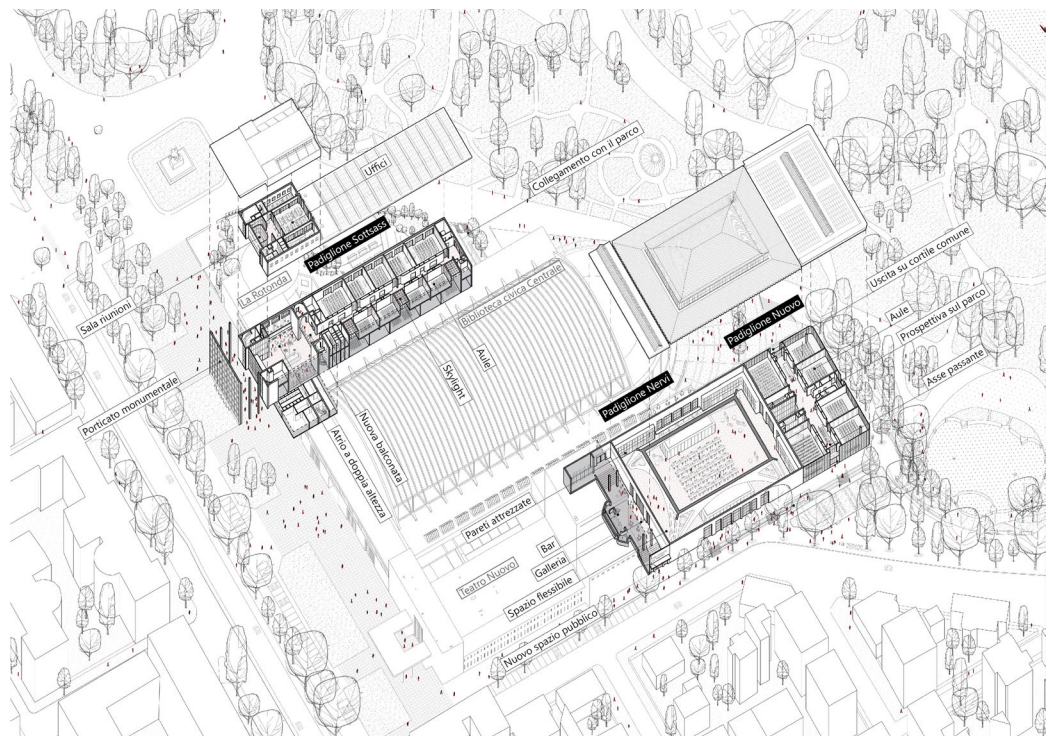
Detail axonometry of Pavilions I (Ettore Sottsass sr), 3A (Pierluigi Nervi) and the New Pavilion (elaboration: Masterplan Team).
